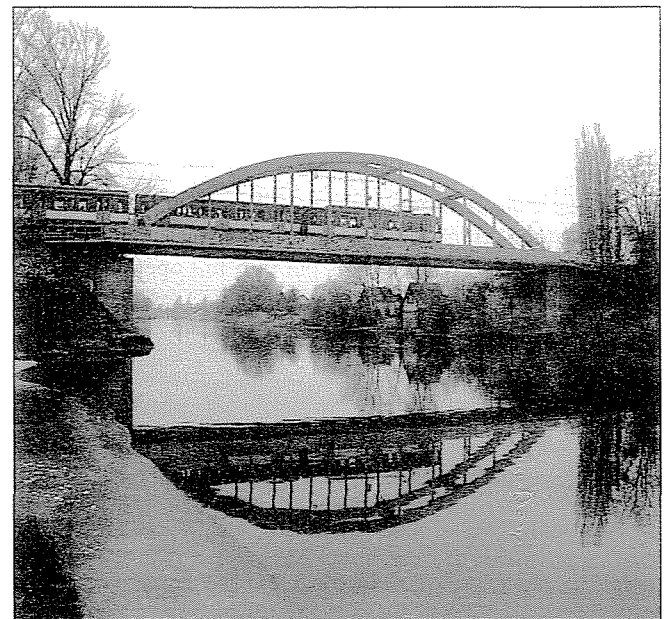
Reinforced concrete arch bridge at Dunaharaszti
